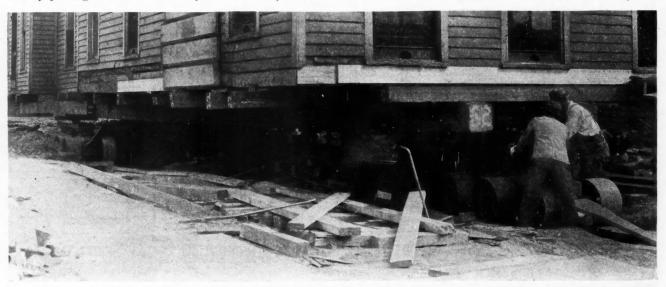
Running the Trucks and Tracking Out on an Incline. This Plan Saves Time and Money in Shortening the Distance That the Building Has to be Raised. In This Instance Two Feet Were Saved in Raising the Building Which Amounts to a Day's Work.
